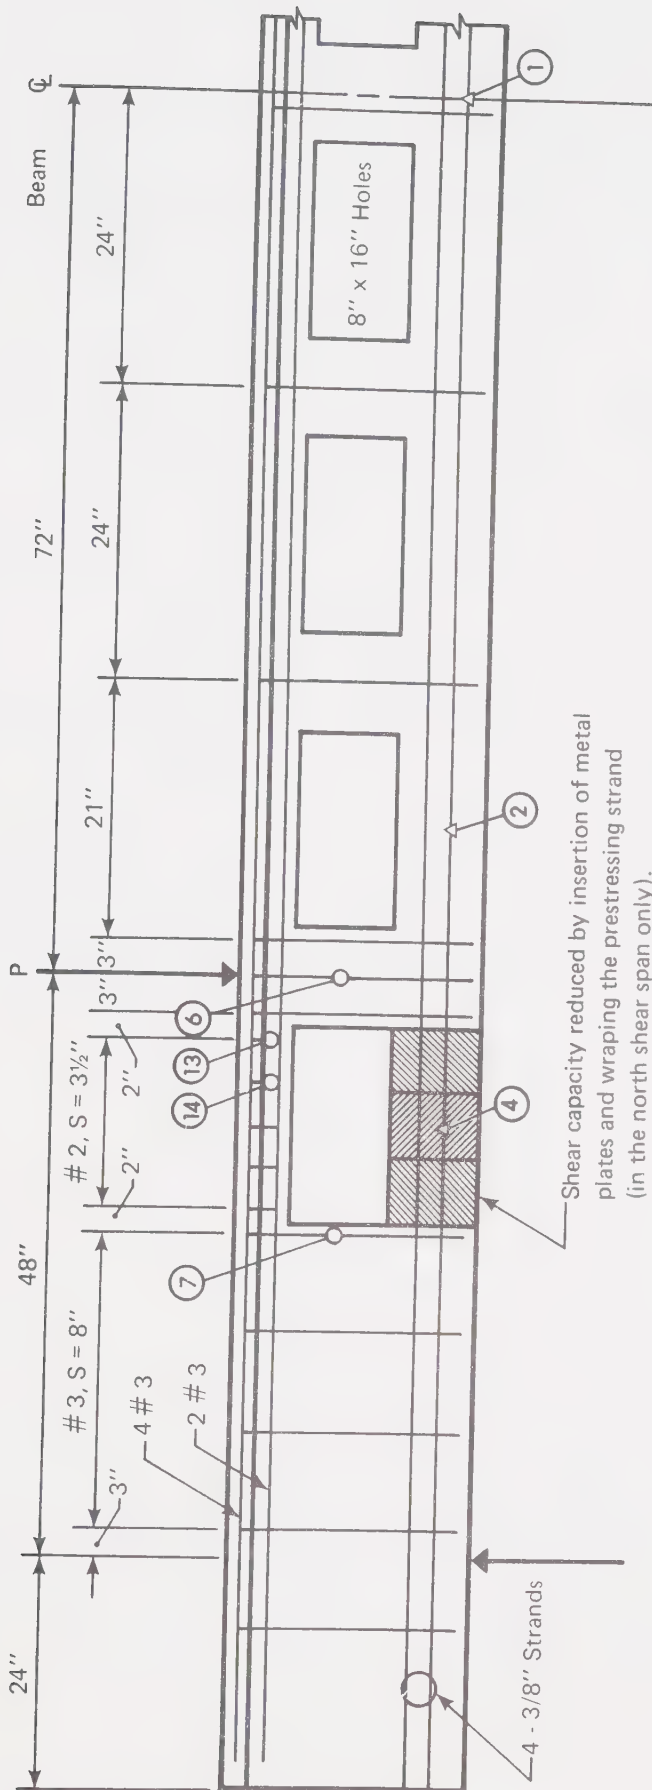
Reinforcement Details and Strain Gage Locations for Beam 5-16-4
